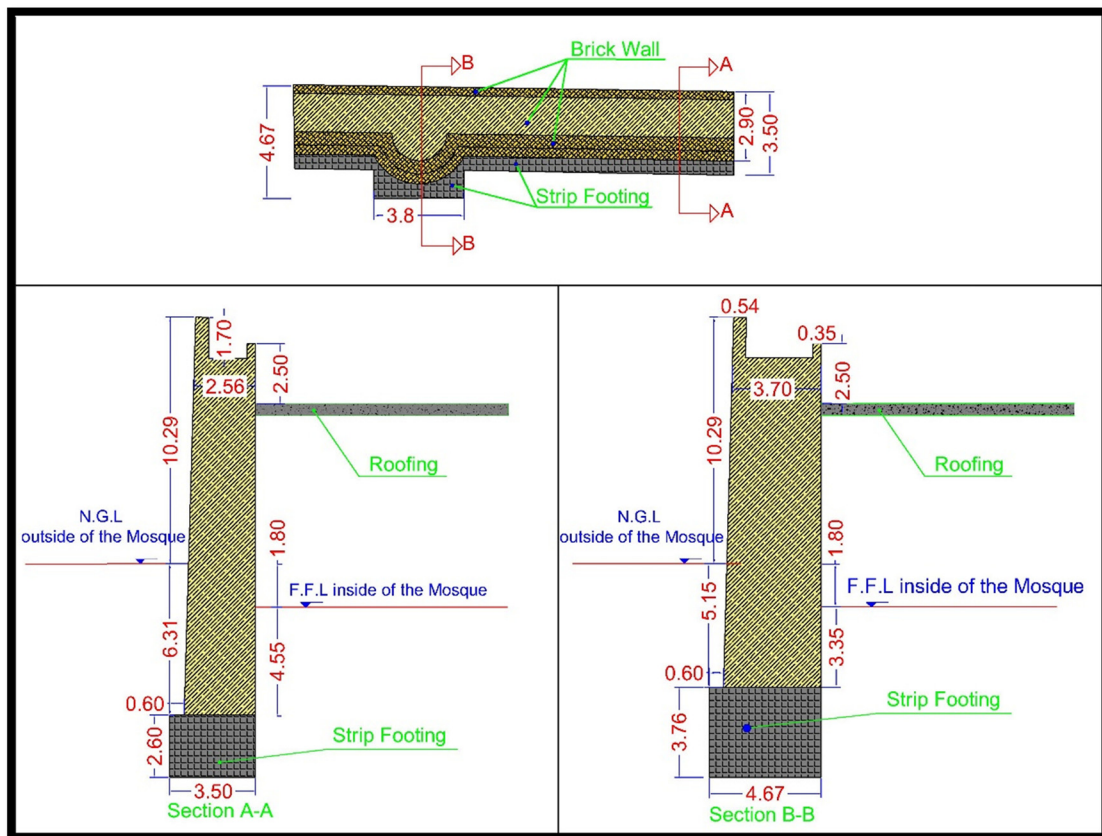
The wall and foundation details of Al-Kufa Mosque.
